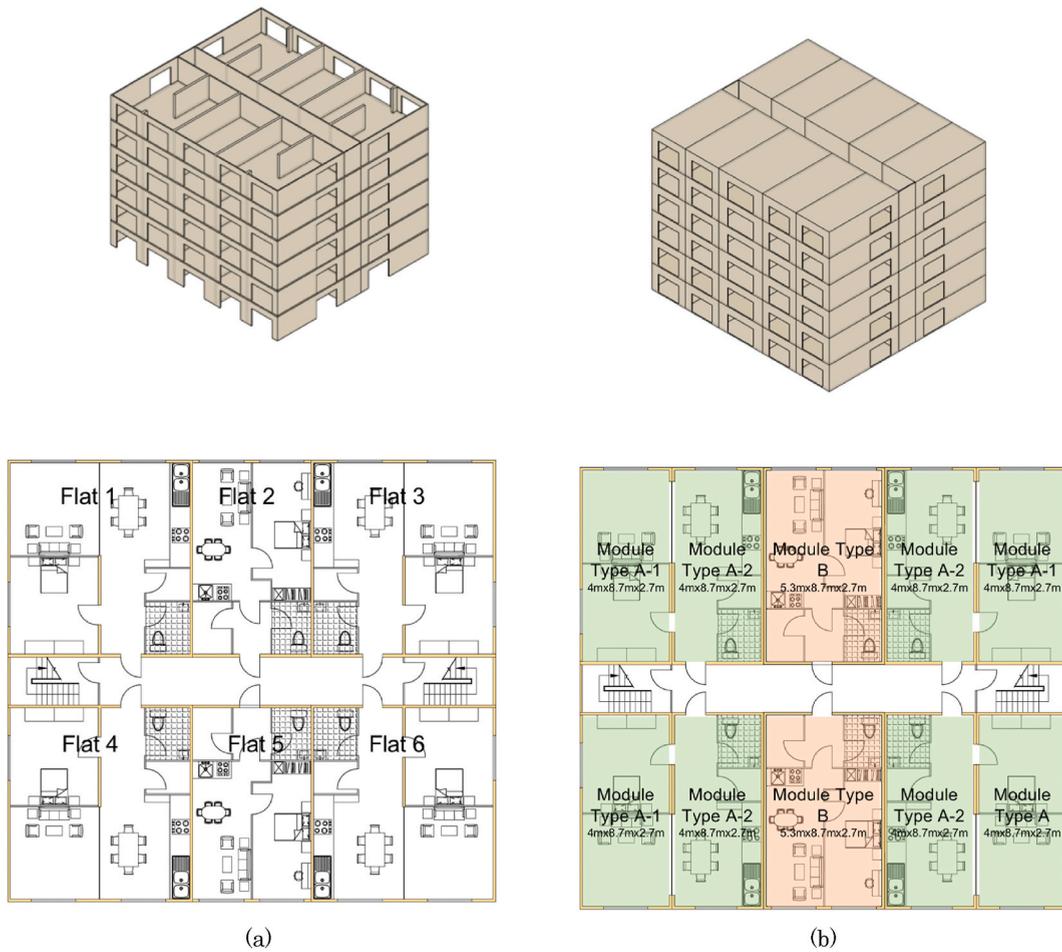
Floor plans and overall structure of the (a) panelised building and (b) the volumetric buildings.
